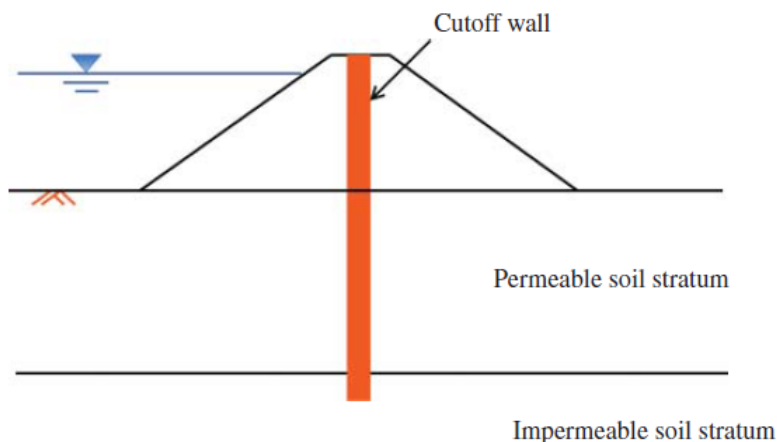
Cross-section view of a slurry cut-off wall in a levee (After USACE, 2000)
